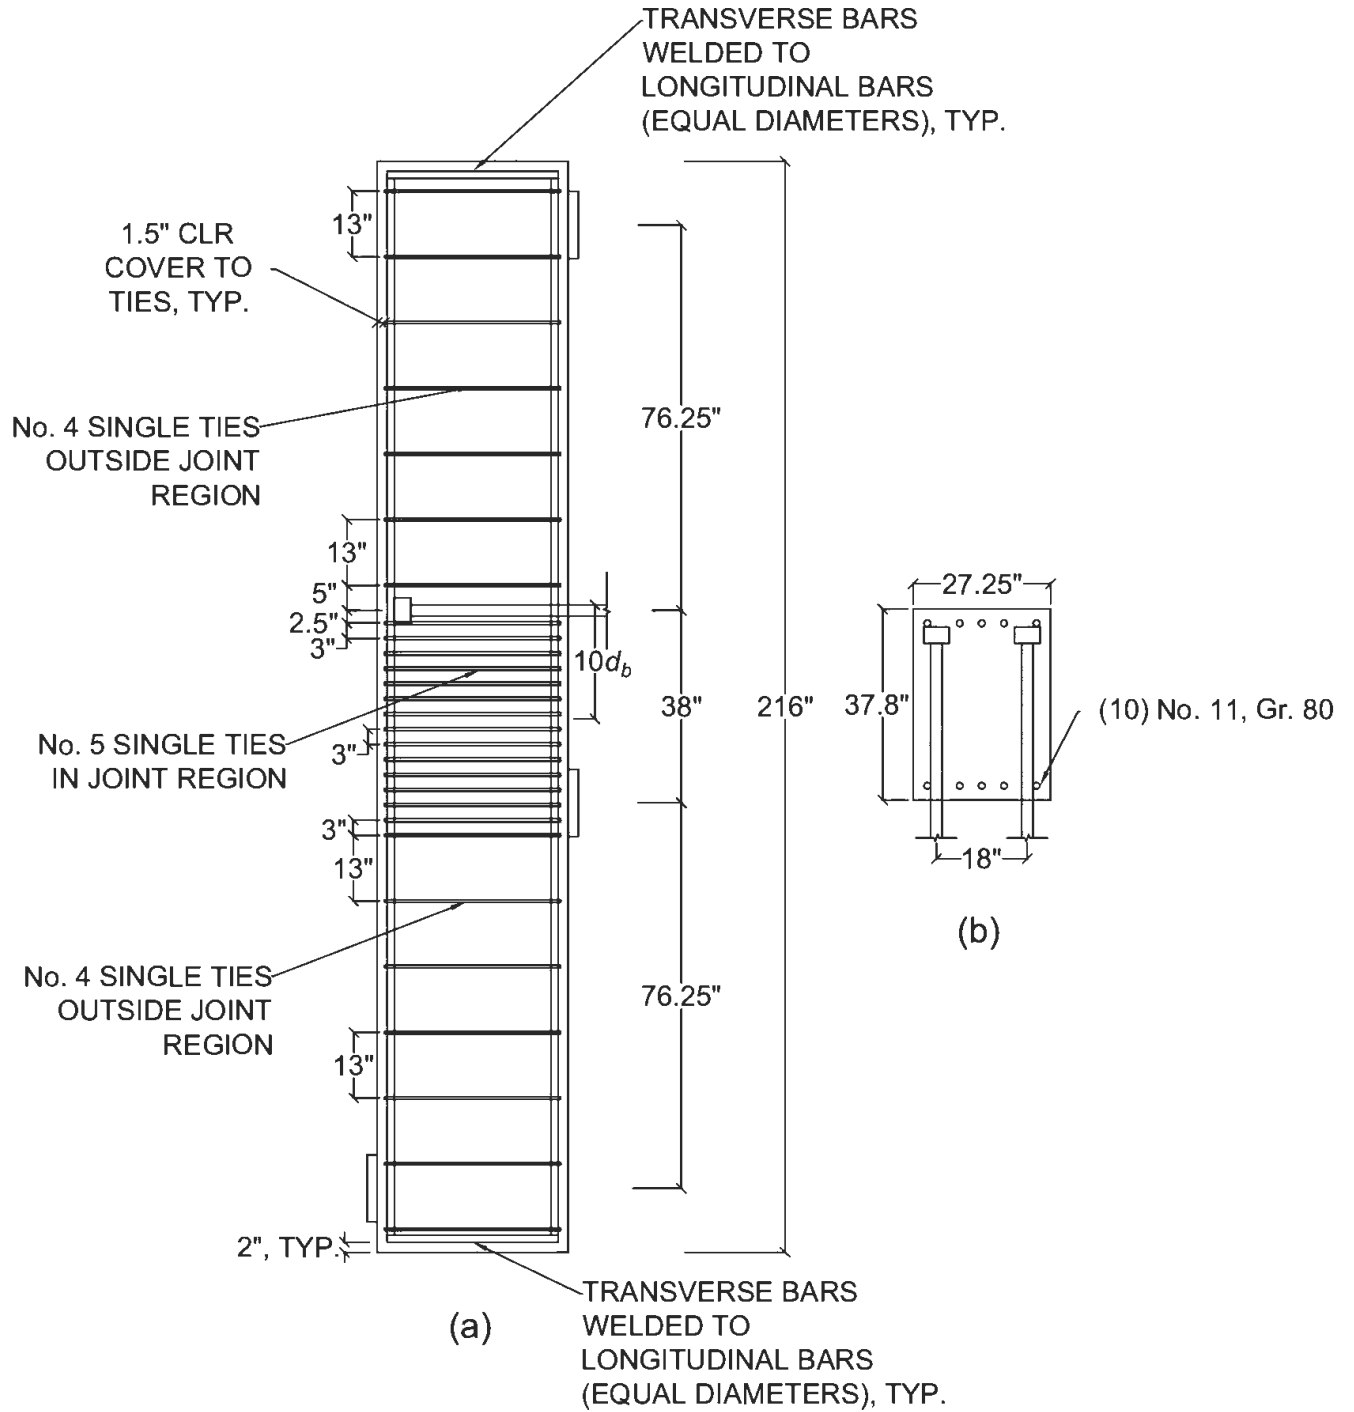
Details of reinforcement layout for No. 18 headed bar specimen 18-1: (a) elevation, (b) cross-section
